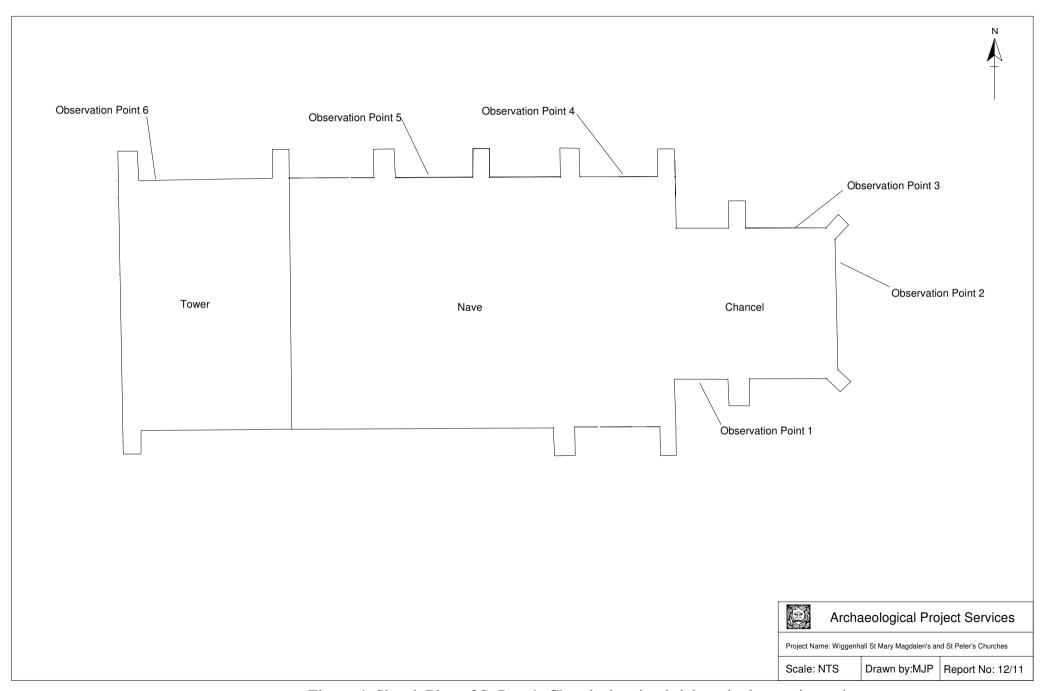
Sketch Plan of St Peter's Church showing brickwork observation points
